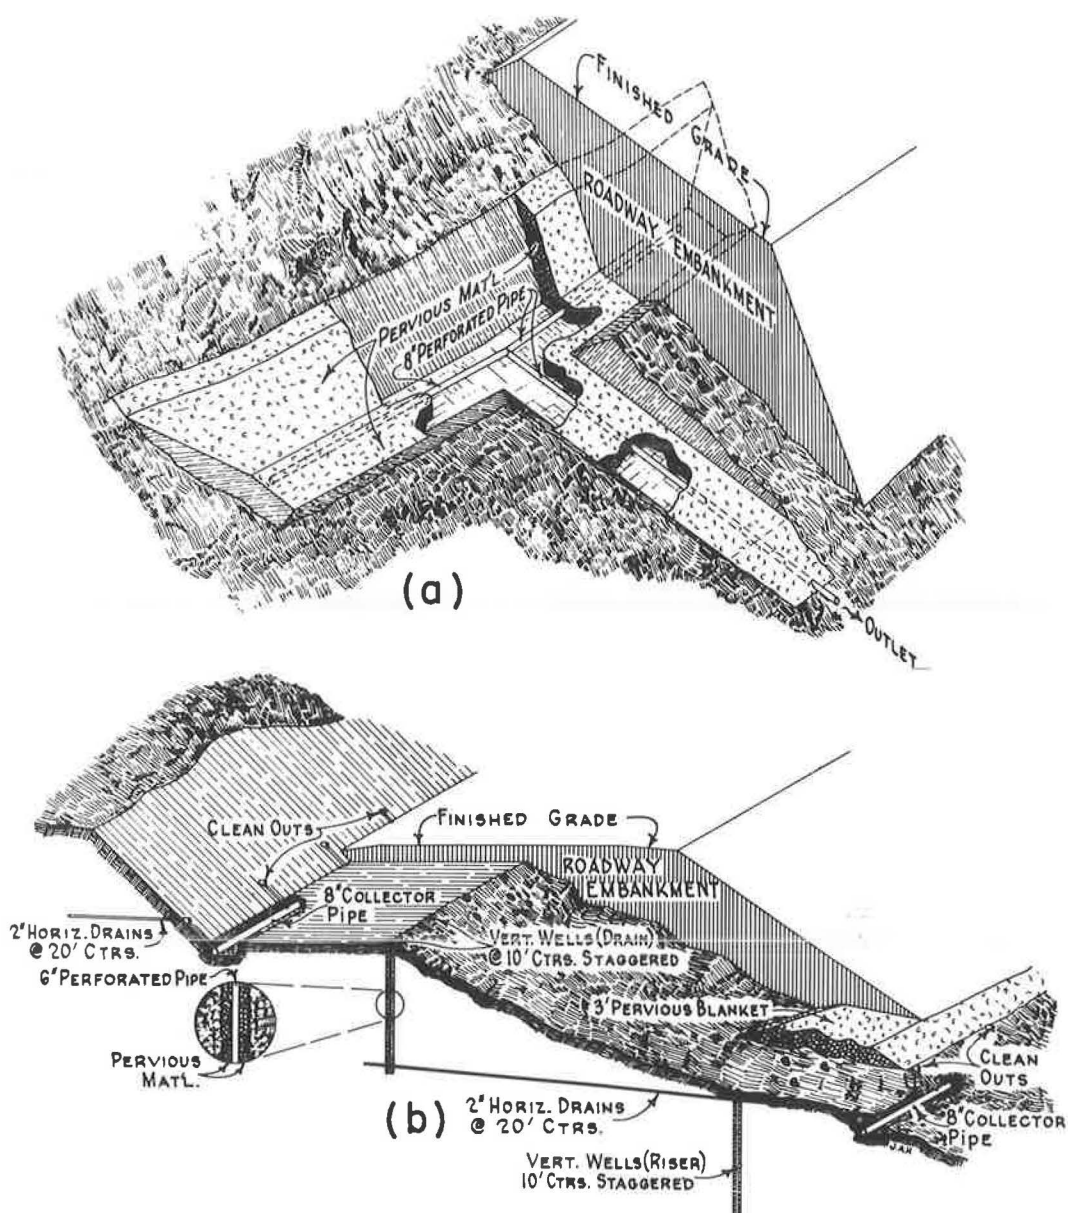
(a) Diagrammatic sketch of stabilization trench, and (b) diagrammatic sketch of embankment stabilization with horizontal drains and vertical relief wells.
